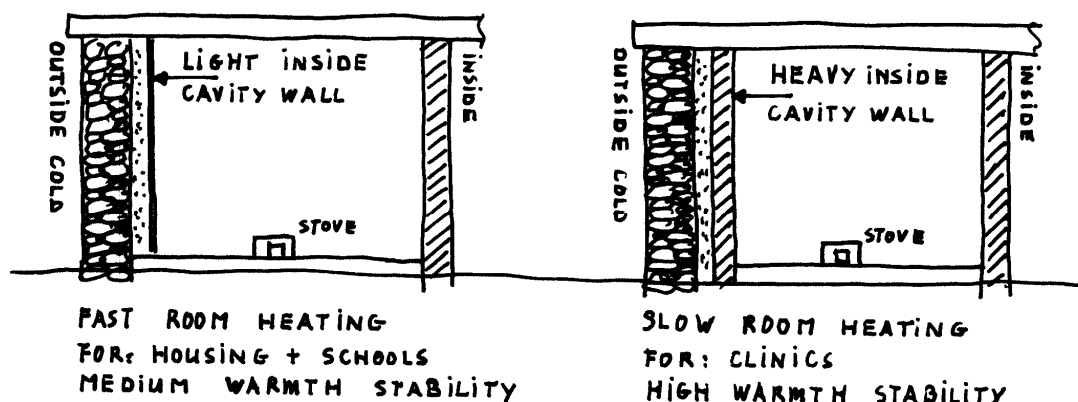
EFFECT OF LIGHT OR HEAVY INSIDE INSULATION WALLS
